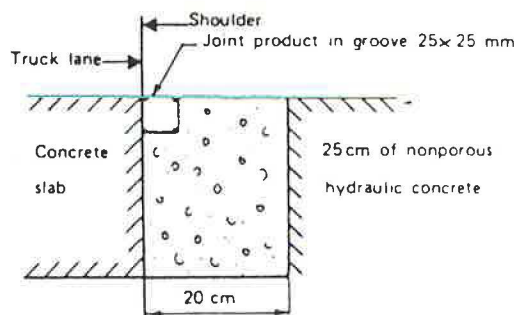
Shallow impervious trench (A6 expressway in France).
